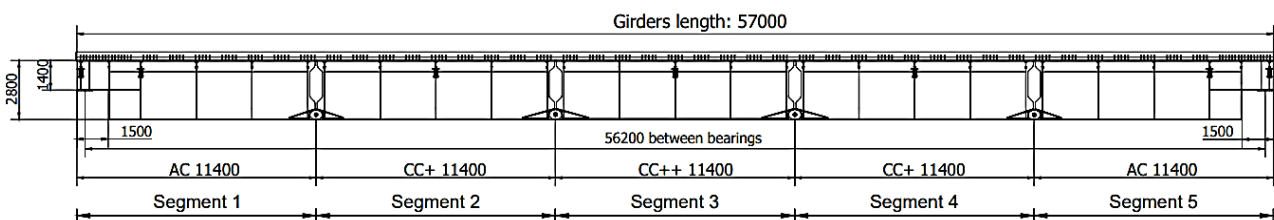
Longitudinal Section of The Bridge (unit in mm)
